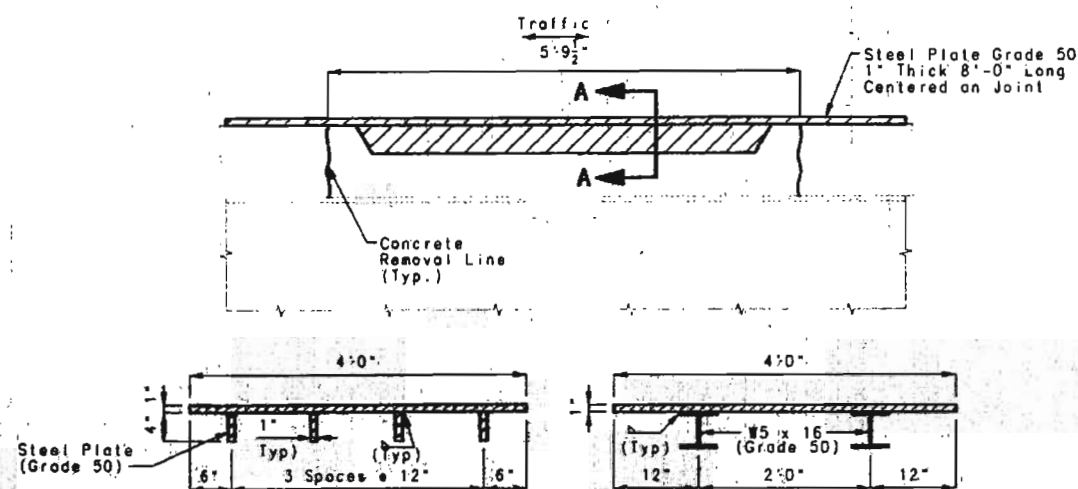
DETAIL SHOWING HALF OF EXISTING DEVICE REMOVED, HALF OF FINGER PLATE DEVICE INSTALLED, NEW CONCRETE NOT POURED OR NOT TO STRENGTH
